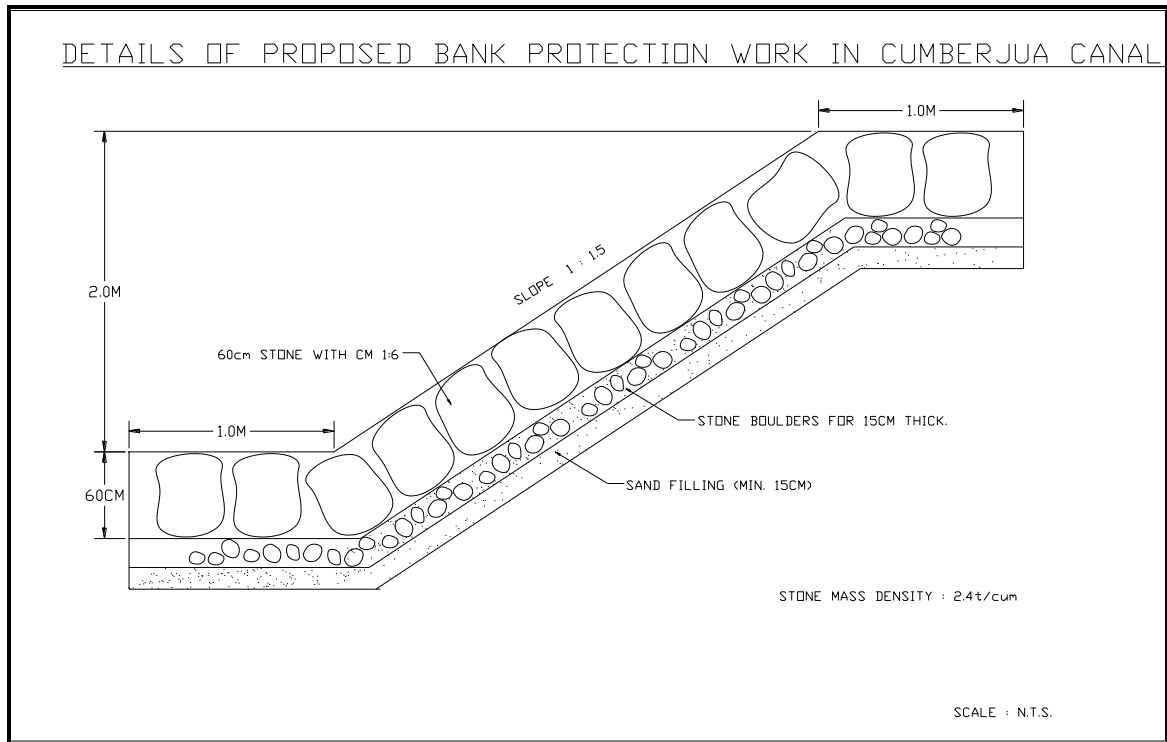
Proposed bank protection works in Cumberjua canal
